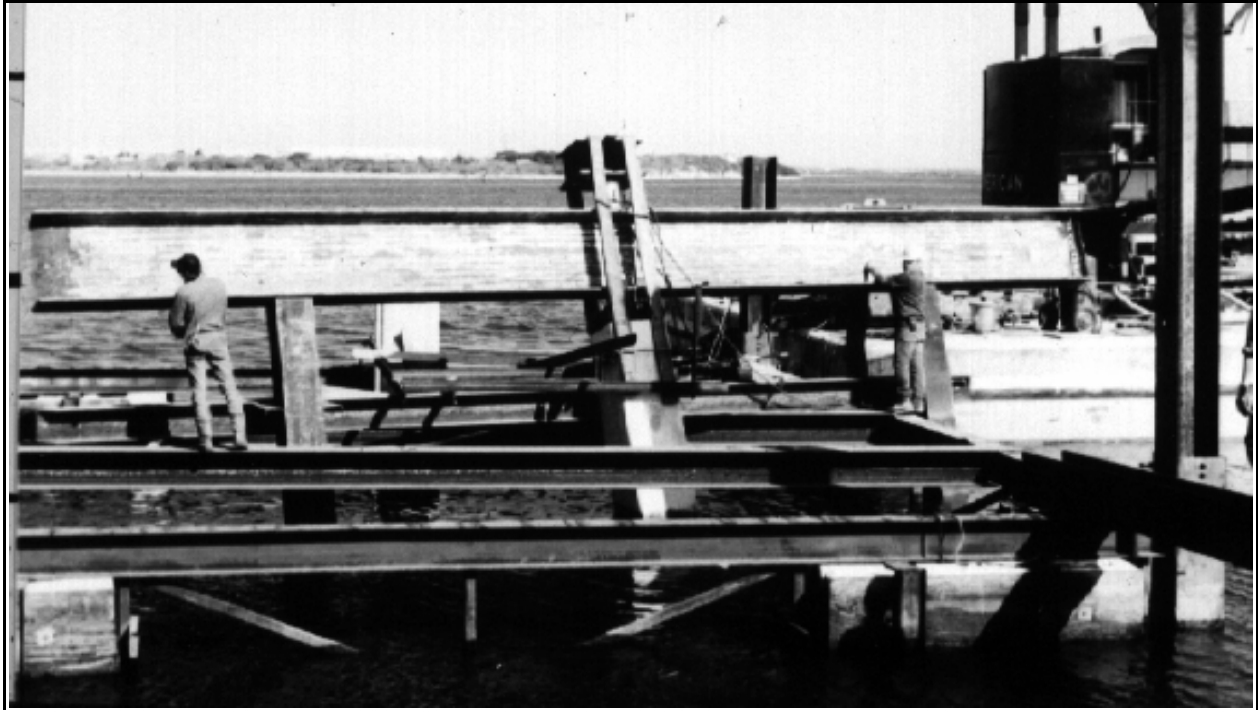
Tension Load Test Arrangement on Batter Pile (courtesy of Florida DOT)
